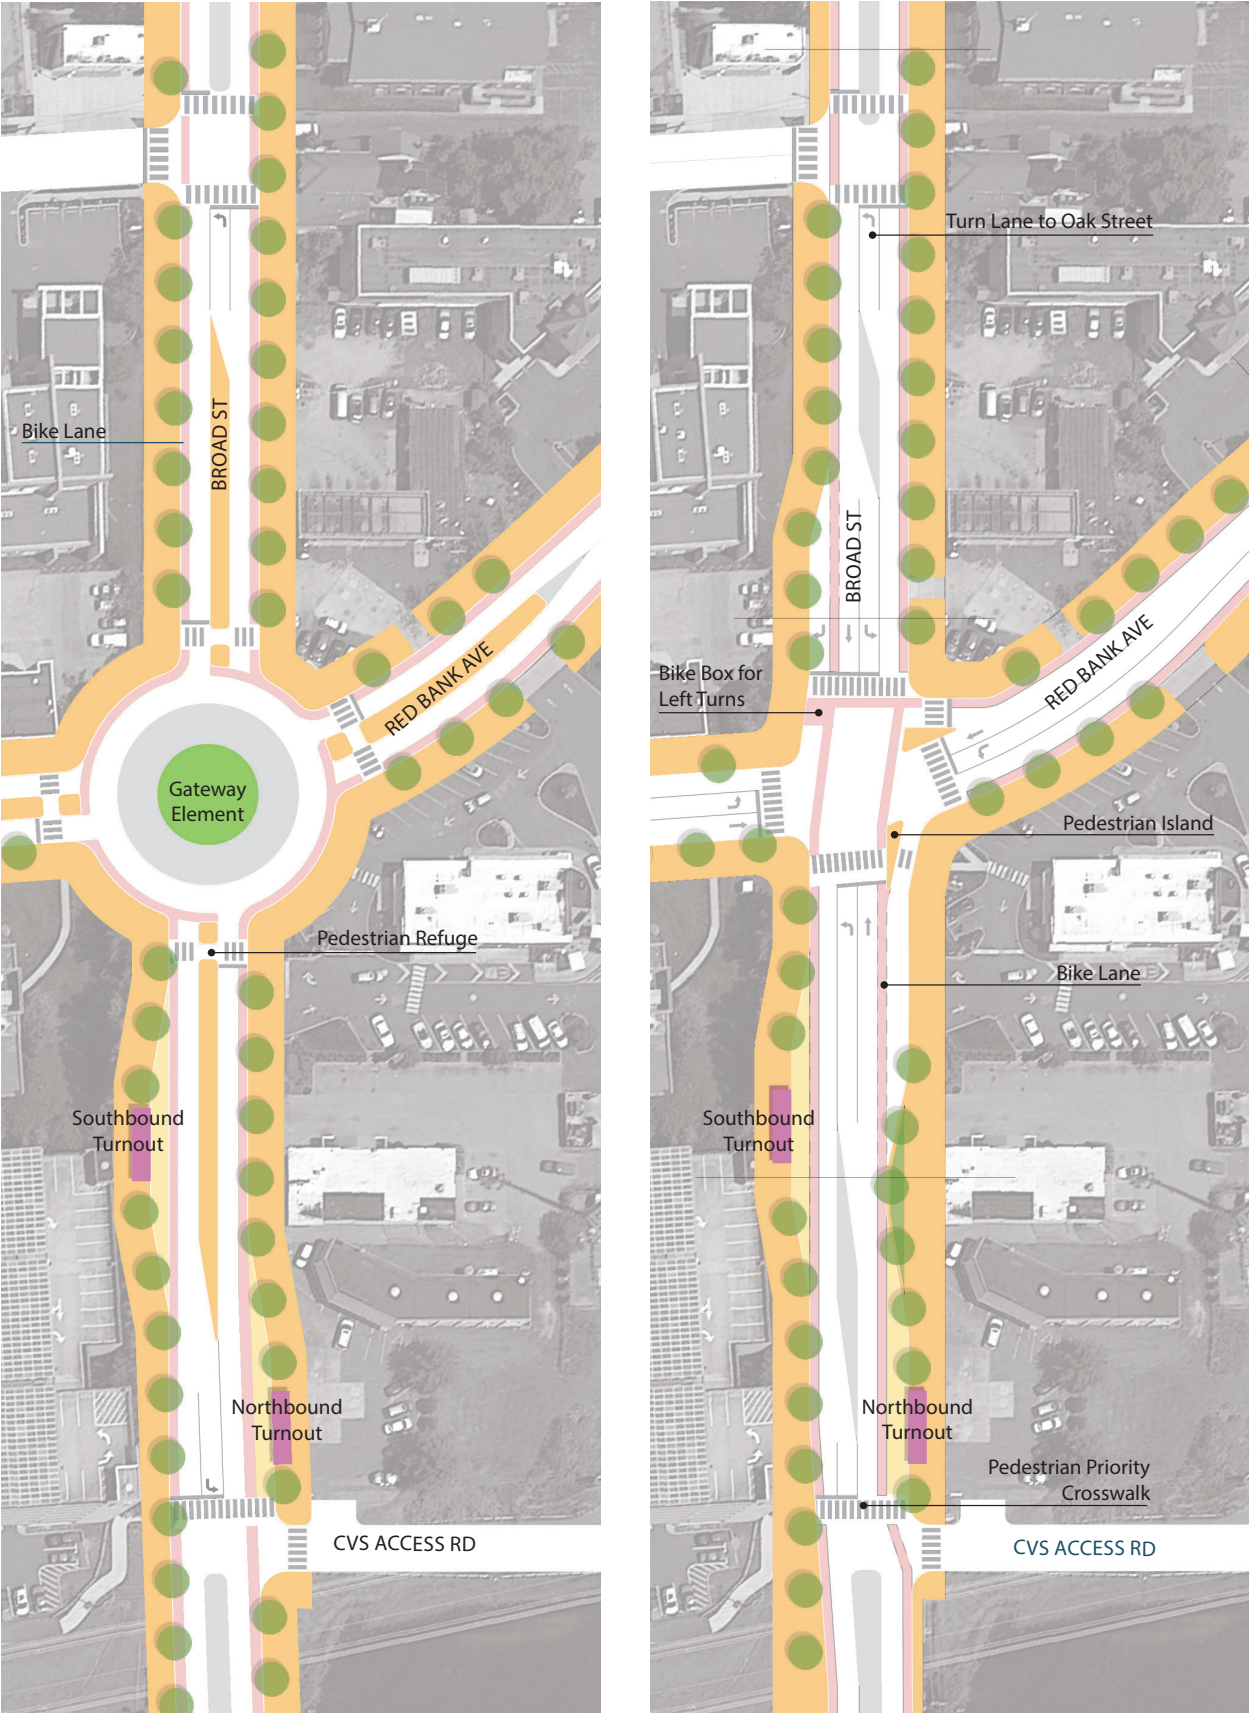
Long-term Recommendations for Red Bank Station Area (Alternative A)
